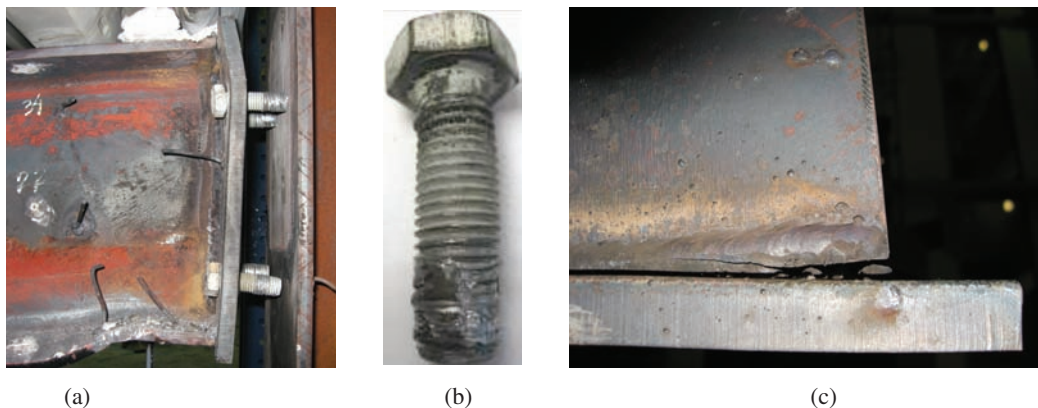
(a) End plate deformation; (b) bolt stripping; (c) weld failure at test FJ03 (view from the top of the beam).
